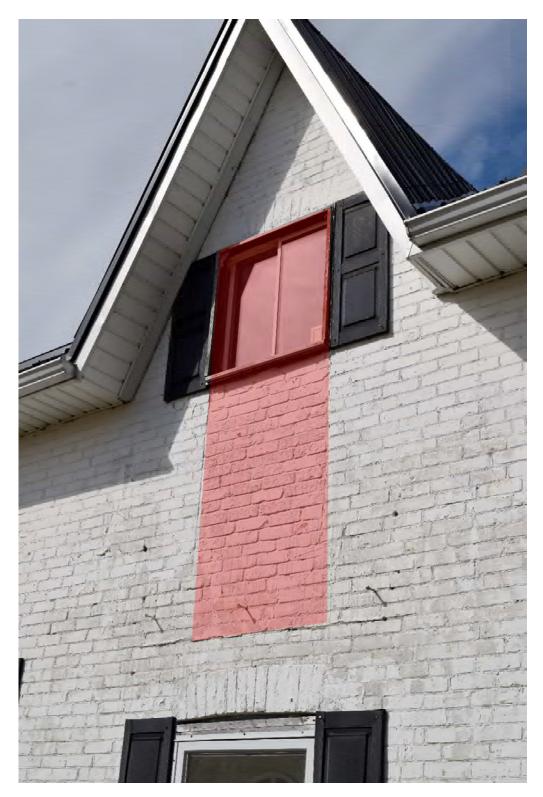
ALTERATION OF ORIGINAL STRUCTURAL OPENING IN CENTER GABLE, LIKELY A DOOR OPENING THAT WAS ALTERED TO ACCEPT A WINDOW, HIGHLIGHTED IN RED
